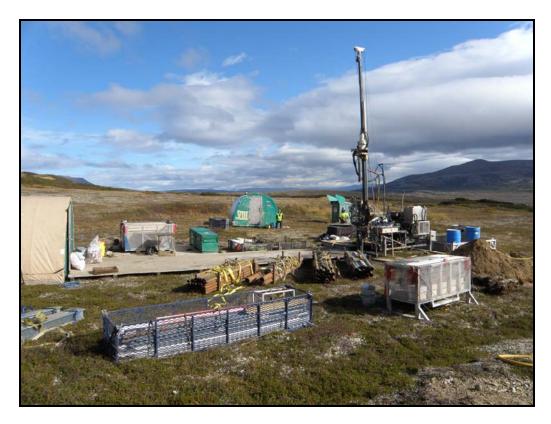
Overview of drill site GH10-I, which was the second Foundex geotechnical drill rig in use at the time of inspection.
